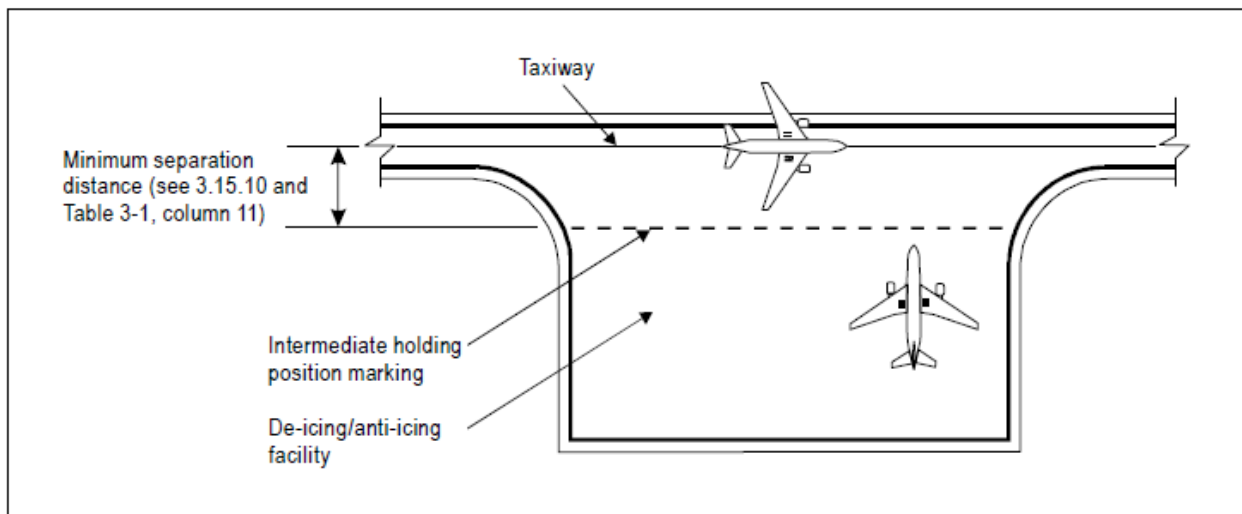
Minimum separation distance on a de-icing/anti-icing facility
